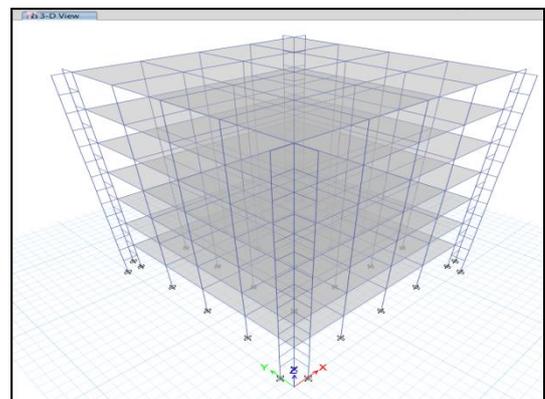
7 Storey RC Building with RC LCF (7RC_LCF)
